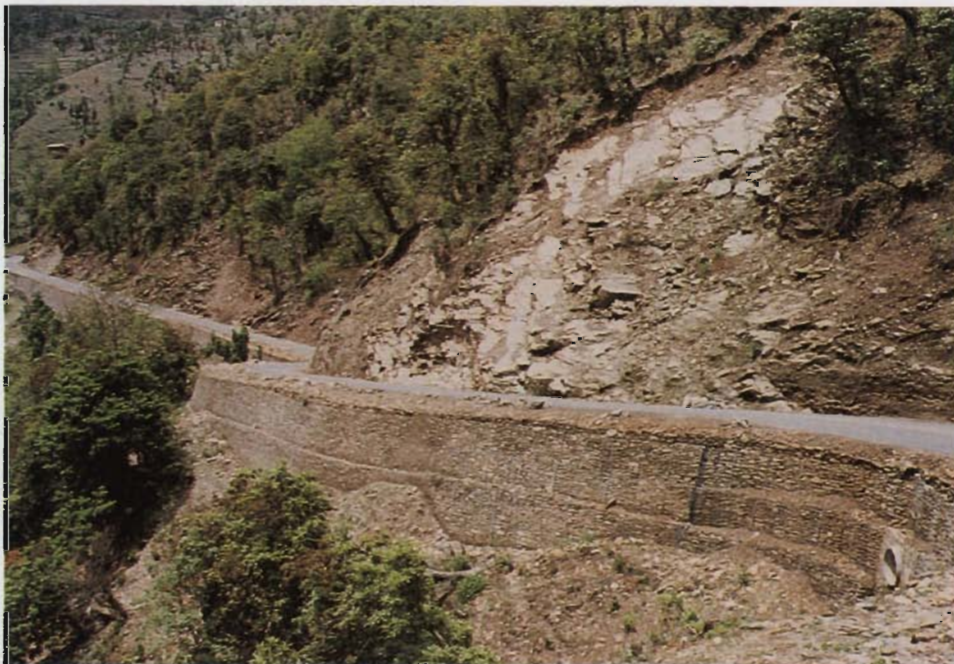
Negligible cut on the ms (left half of road section), entire road profile supported by vs retaining wall.
